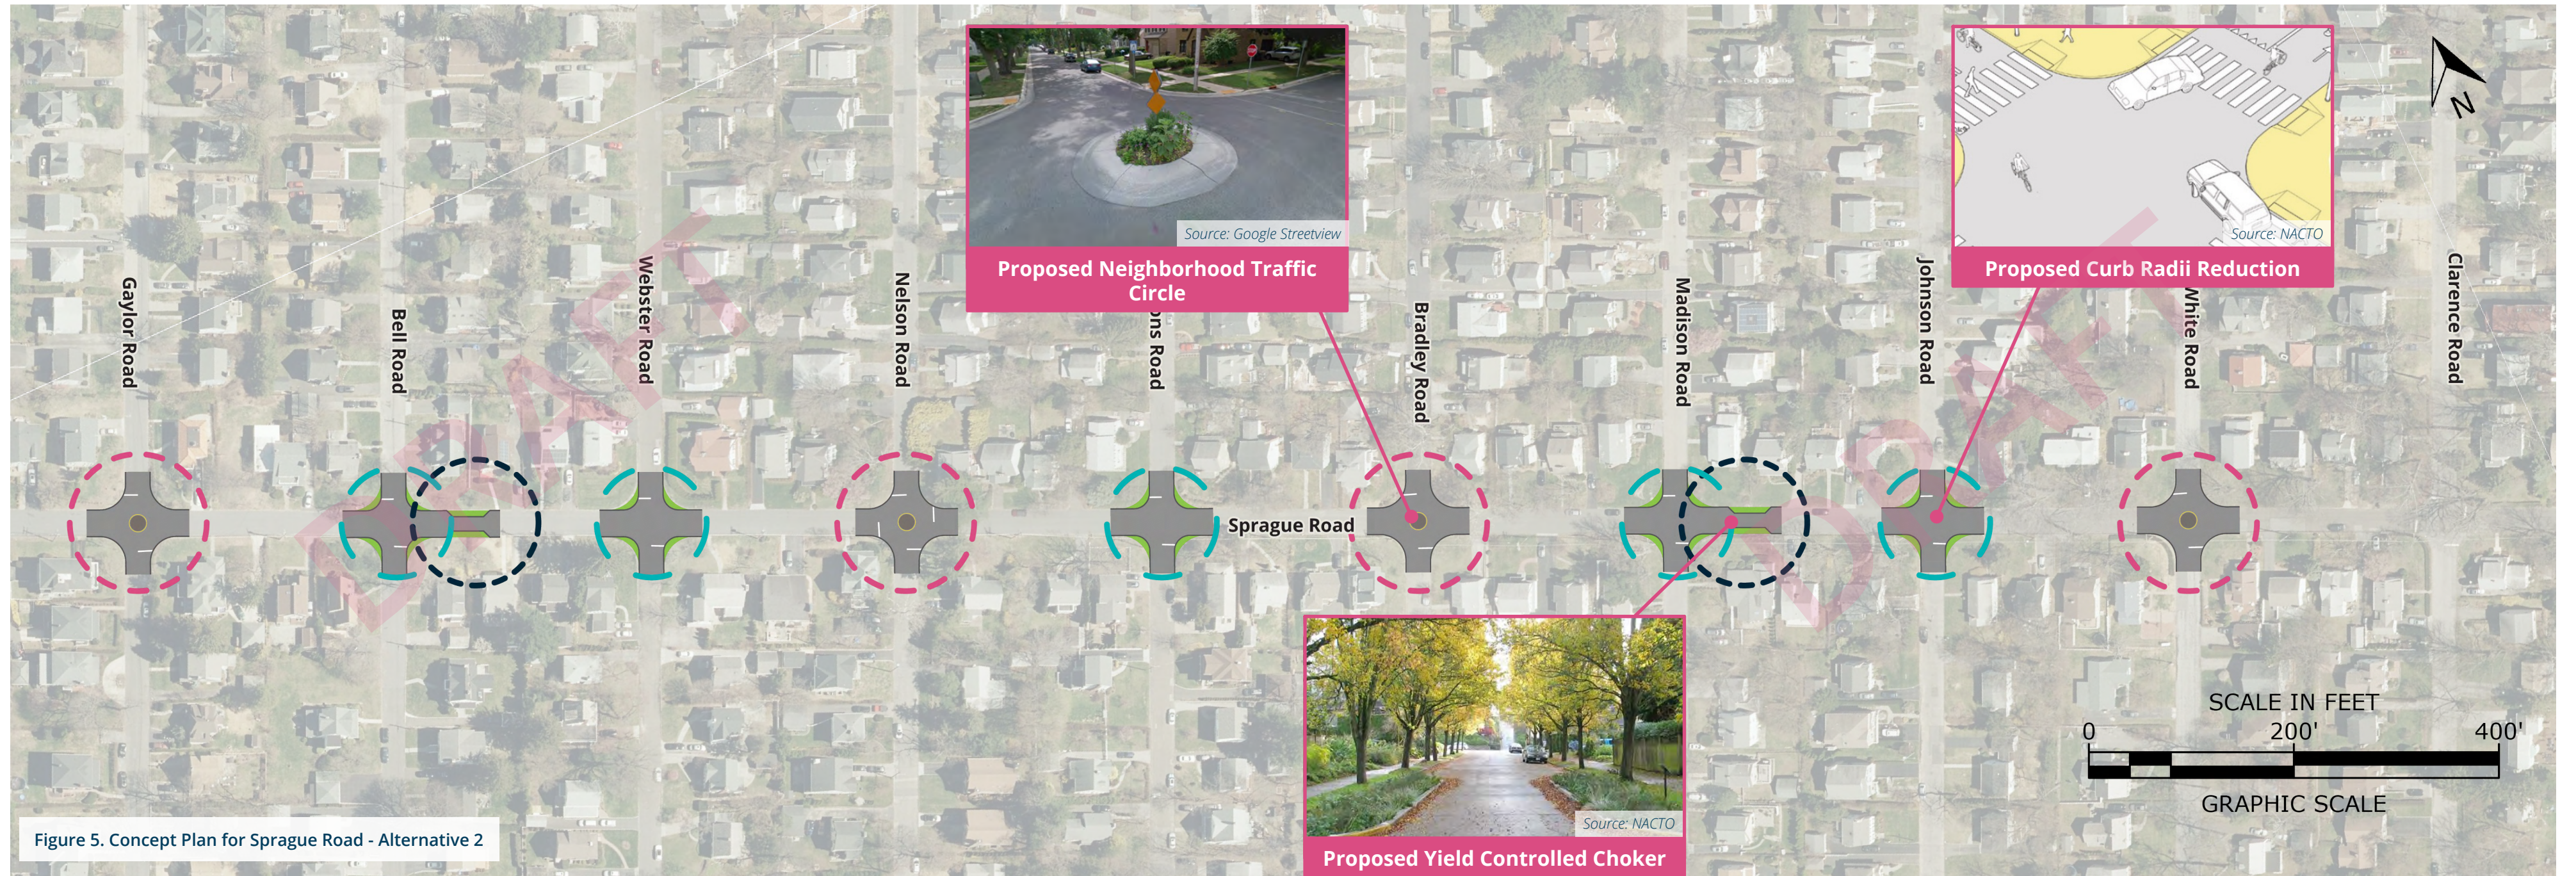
Concept Plan for Sprague Road - Alternative 2 Inset
